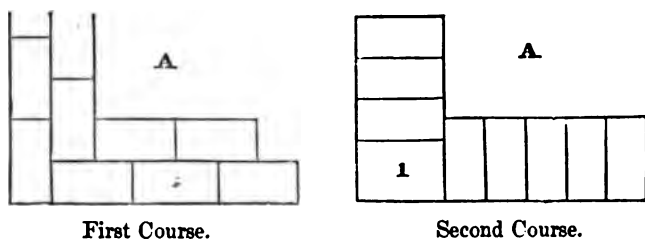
ENGLISH BOND.—FOURTEEN-INCH WALL.
